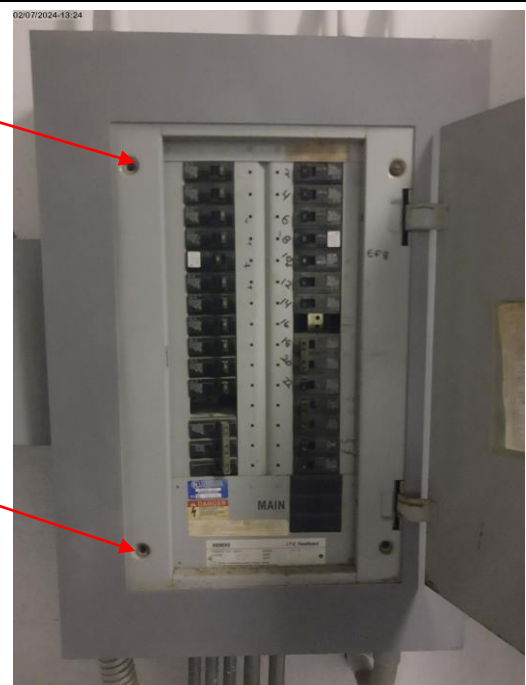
Item 7.28.b. Level Roof. Mechanical Room. Panelboard RL. Missing screws.
